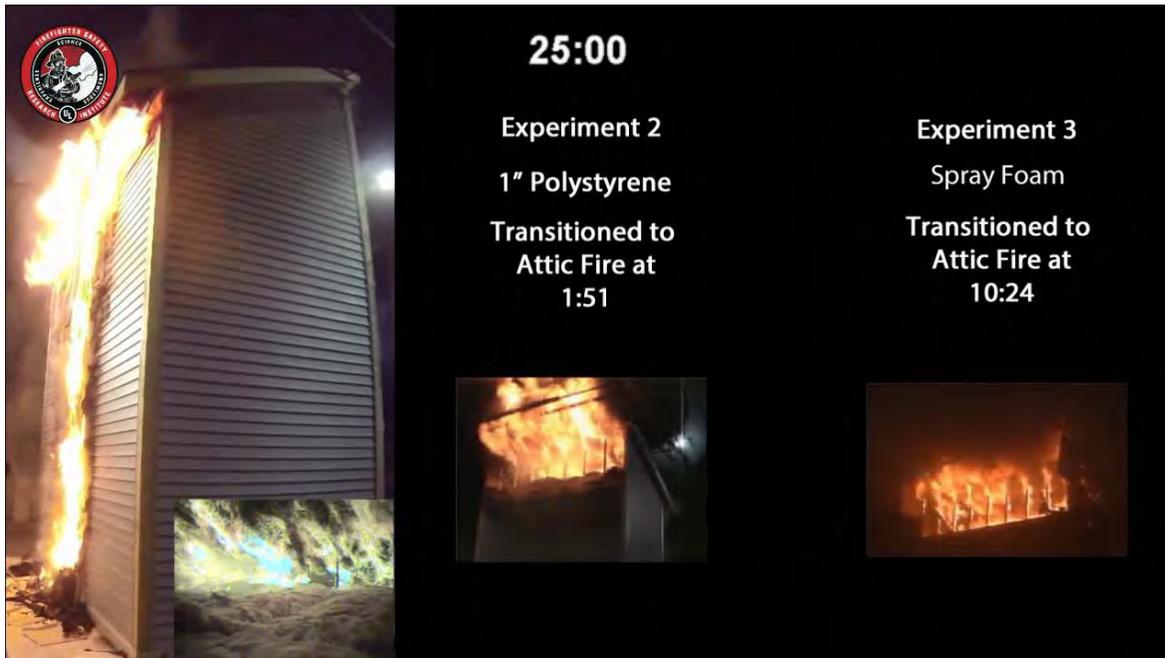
15. Wall and Eave experiment as Vinyl Siding/OSB Sheathing/Fiberglass Insulation system transitions to an attic fire (25 minutes after ignition)
